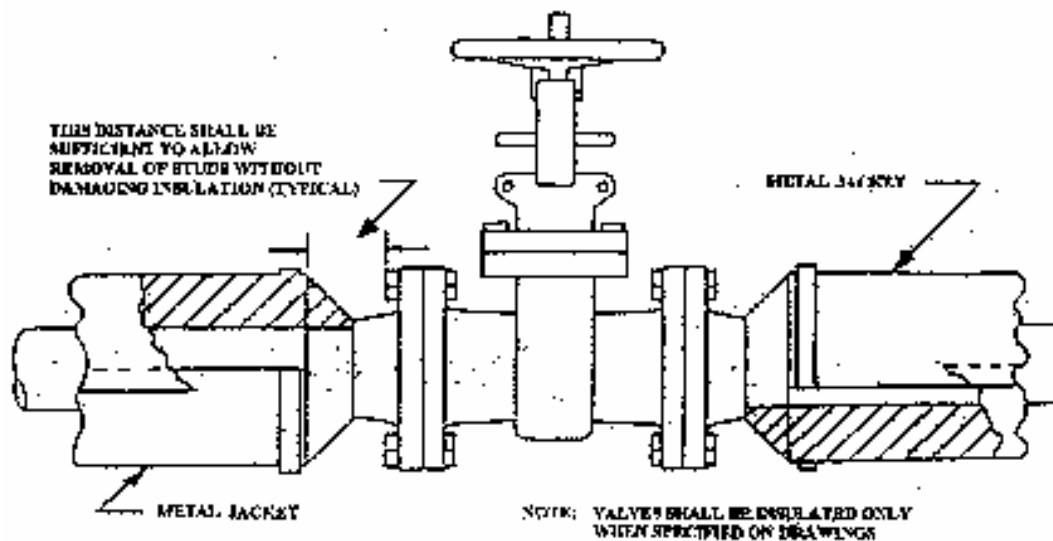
Typical detail for uninsulated flanged valve Class H insulation
